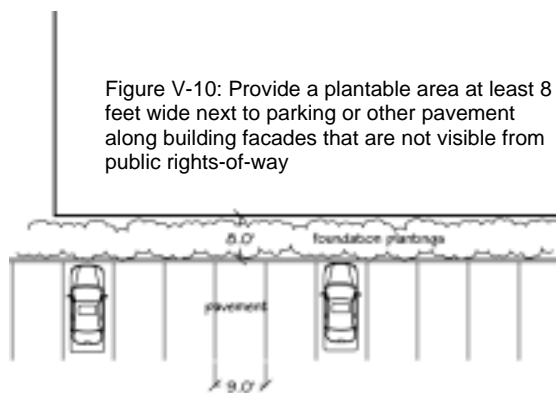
Provide a plantable area at least 8 feet wide next to parking or other pavement along building facades that are not visible from public rights-of-way
